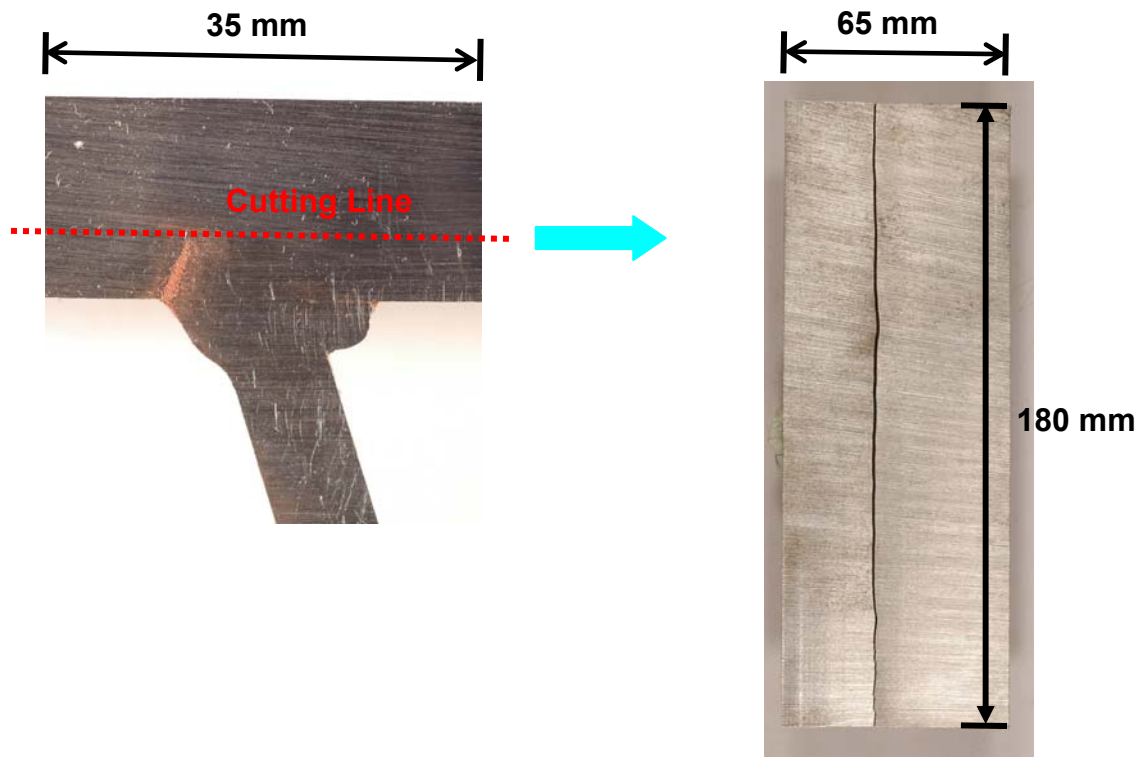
Specimen 2: Indication of Linear Crack at Rib-to-Deck PJP Weld (Piece Location C1)
